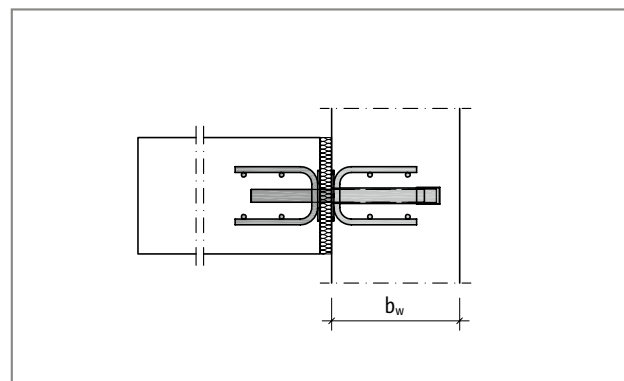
Schöck Dorn type SLD-Q: Minimum structural component thickness of a wall or column
